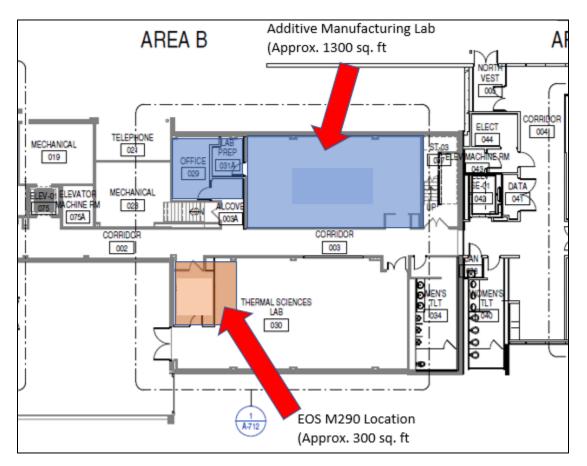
Location of the additive manufacturing lab in the Zollner Engineering Center Expansion Project
